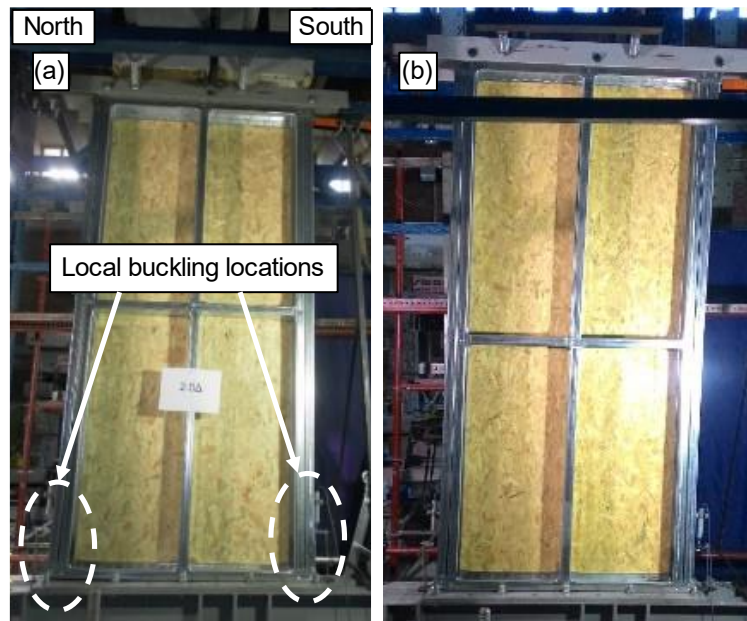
Wall panels at 4% lateral drift: (a) with gravity load; (b) without gravity load
